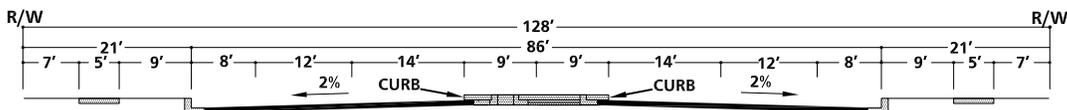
CITY OF EASTVALE GENERAL PLAN ROADWAY CROSS-SECTIONS
